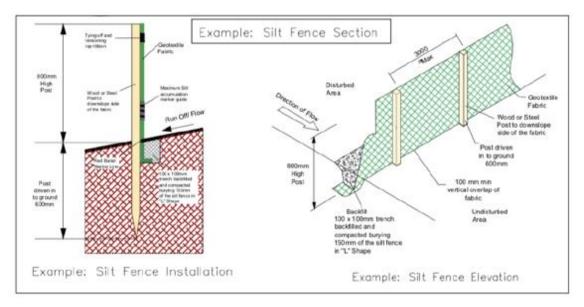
An example of the silt trap to be erected before the commencement of works on site.
